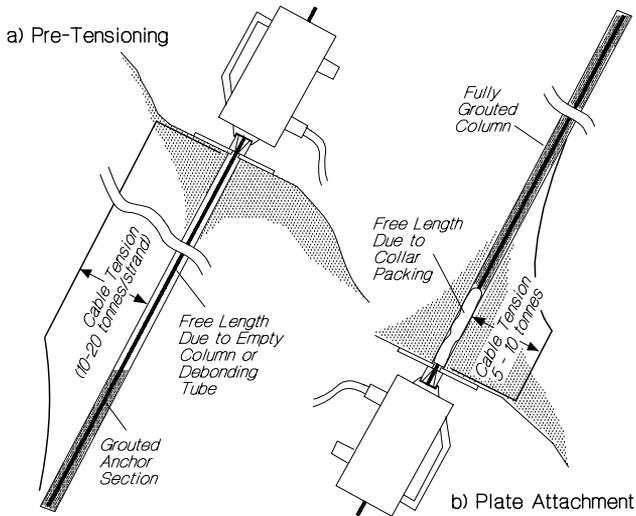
Cablebolt anchorage for: a) Pre-tensioning; b) Cablebolt plating
